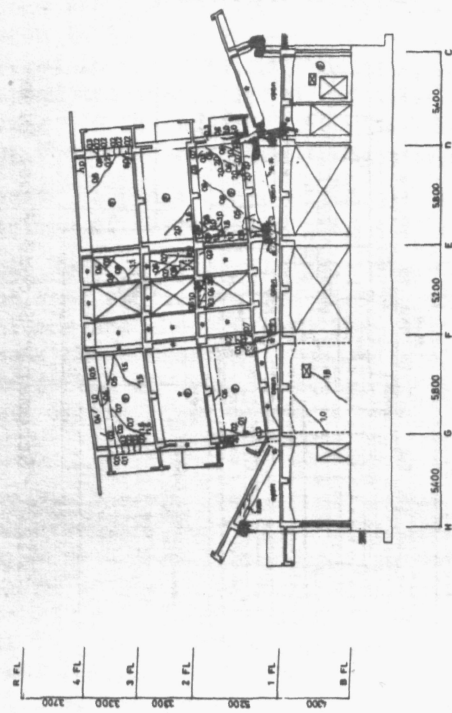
Structural Damage to Section B-B (West Elevation)
